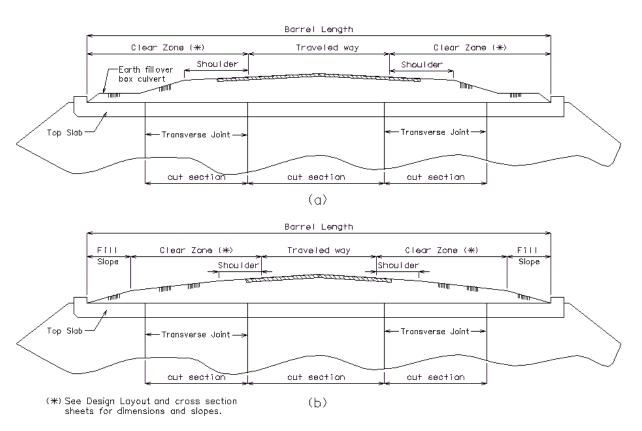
Elevation view along centerline of box culvert (a) shallow earth fill (b) deep earth fill
